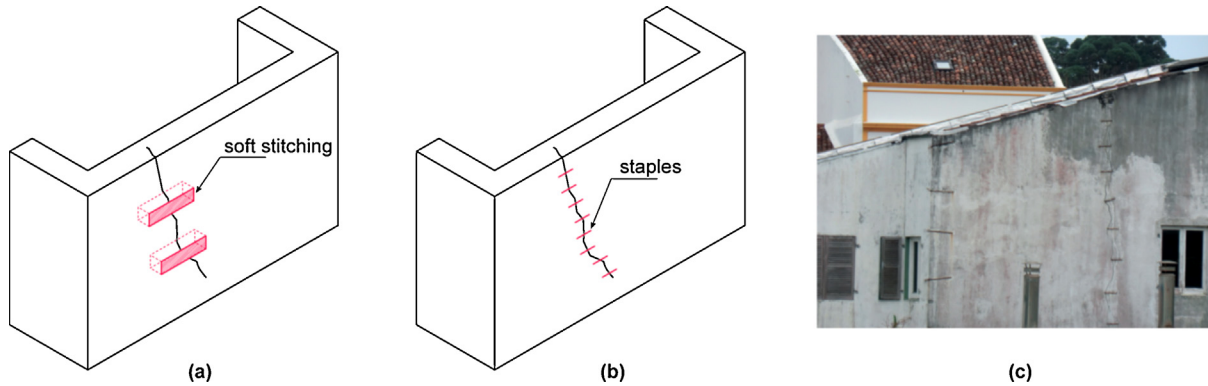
Mended cracks: (a) soft stitching, characteristic of rammed earth constructions; (b) staples, characteristic of stone masonry construction; and (c) example of mended cracks in Azores, Portugal (photo by Mariana Correia, 2013).
